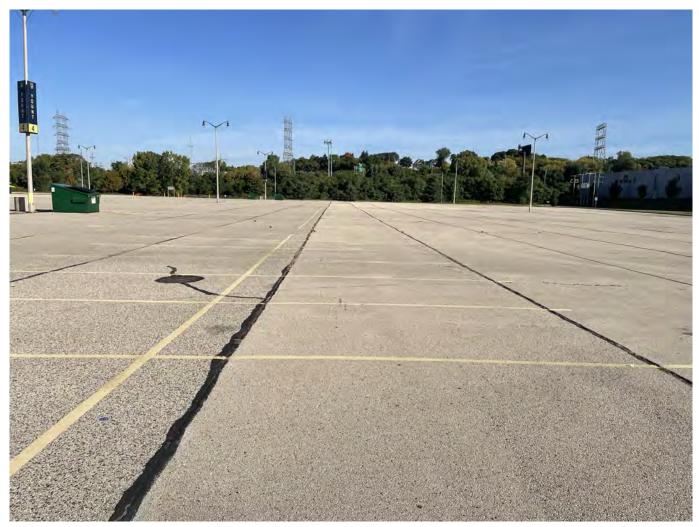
Yount Lot: Asphalt cap over Yount Lot: 4-inch asphalt pavement overlying 8-inches of crushed aggregate base course.
